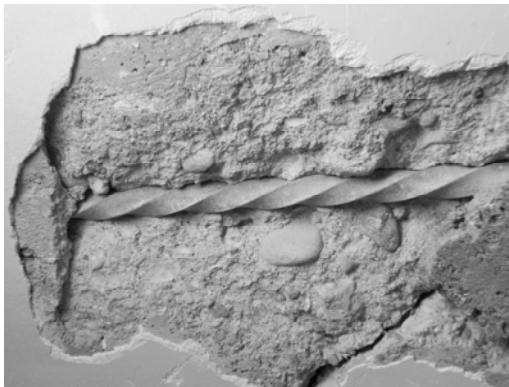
Ransome Bar Reinforcing Main Floor Slab in the Peter MacKinnon Building, University of Saskatchewan Campus.
